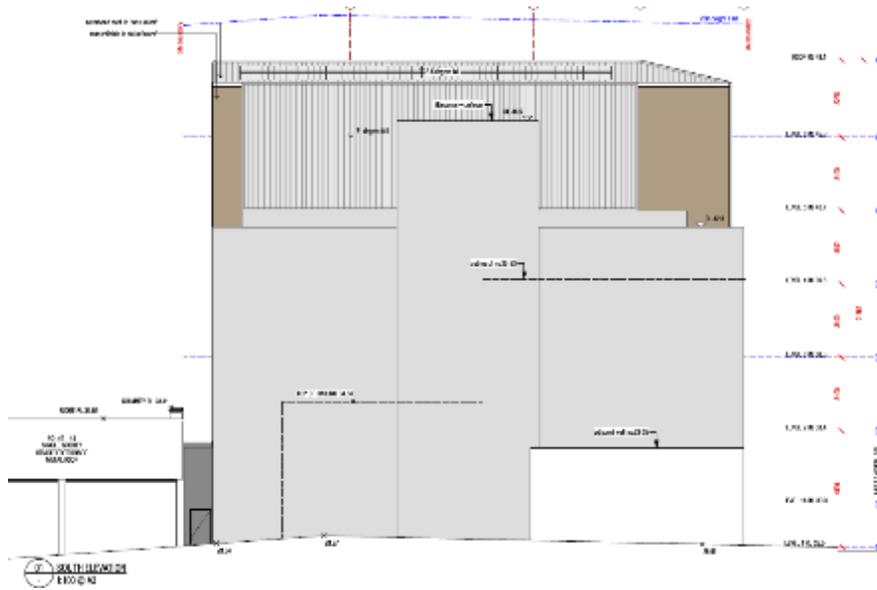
Photomontage and elevations of the original proposal lodged on 15 September 2020
